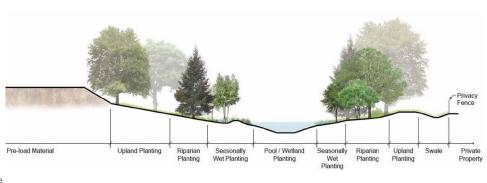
Cross-section of the site with planting of restored vegetation and pre-load material.
